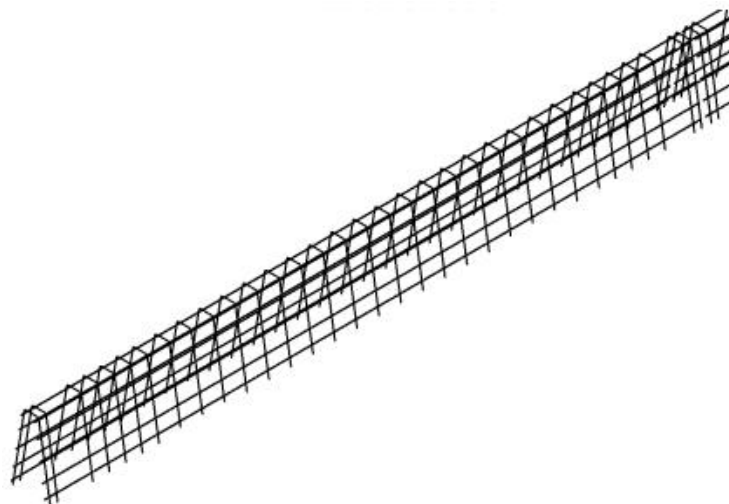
Isometric View of the Reinforcement Cage Consisting of Longitudinal Rebars and Stirrups.
